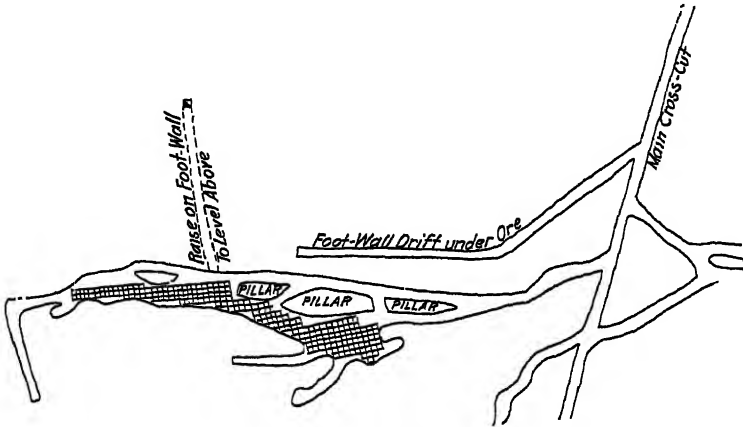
PLAN OF DAY STOPE; FOOT-WALL STOPING BEGINNING.
